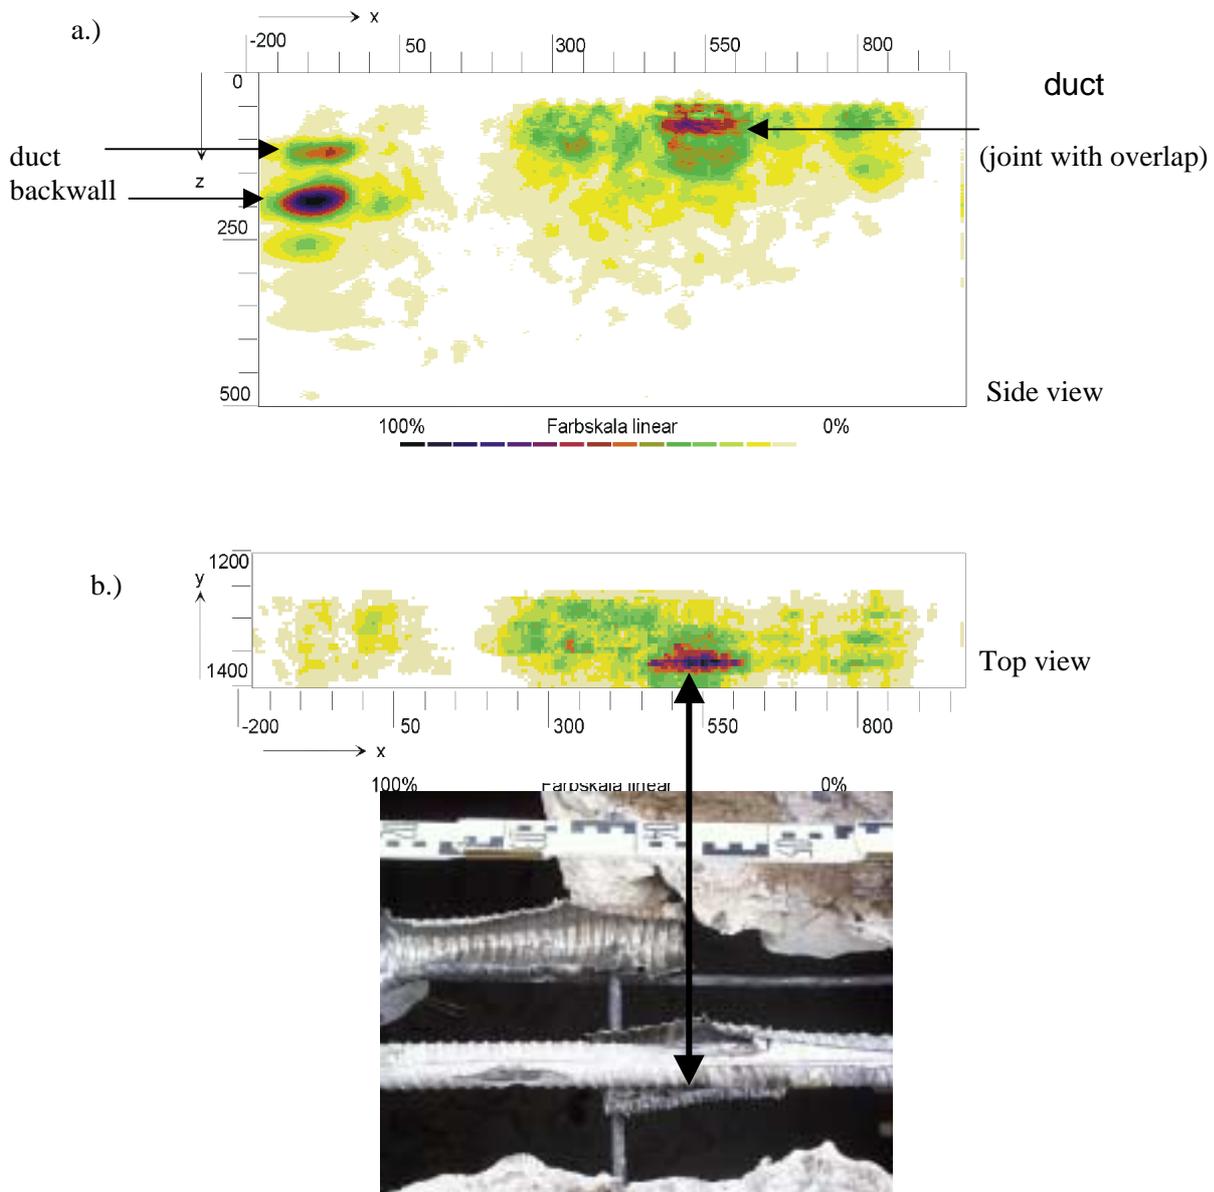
Application of ultrasonic inspection on concrete motor way bridges
